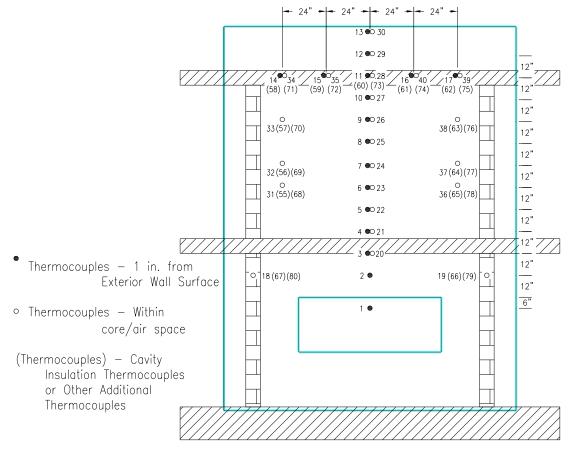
Instrumentation Arrangement (Exterior Face, Air Cavity, and Extra TCs if Needed).
